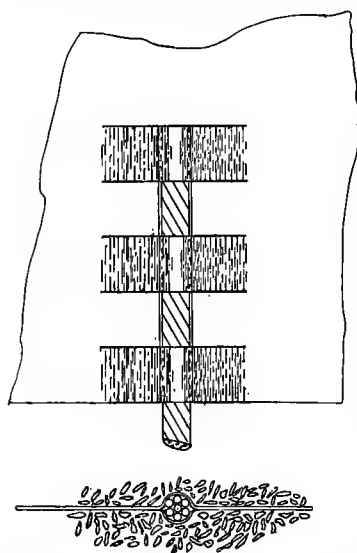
PLAN AND SECTION OF EARTH PLATE SHOWING CONNECTION TO COPPER CABLE.
